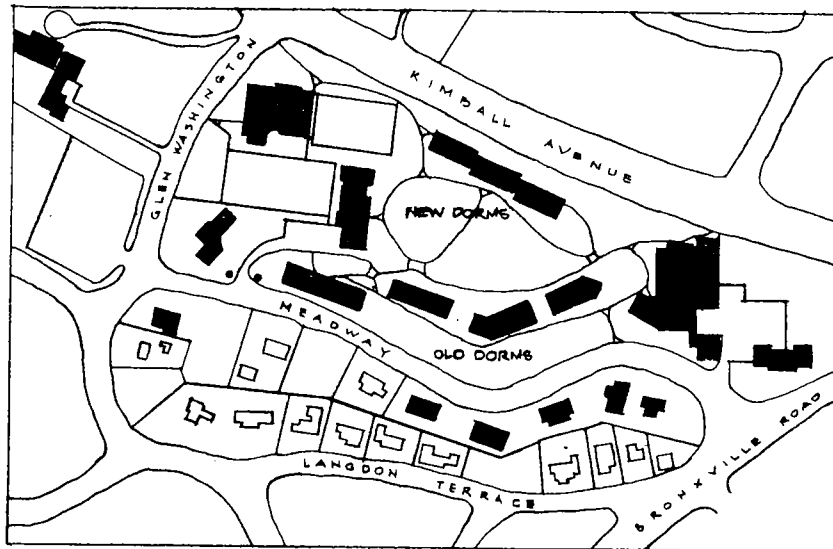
Site Plan of Sarah Lawrence College, Bronxville, New York. Dormitories are situated on either side of the main campus commons. Old dorms: MacCracken, Lawrence, Titsworth, Gilbert. New dorms: Rothschild, Carrison, Taylor. (Courtesy of Sarah Lawrence College)
